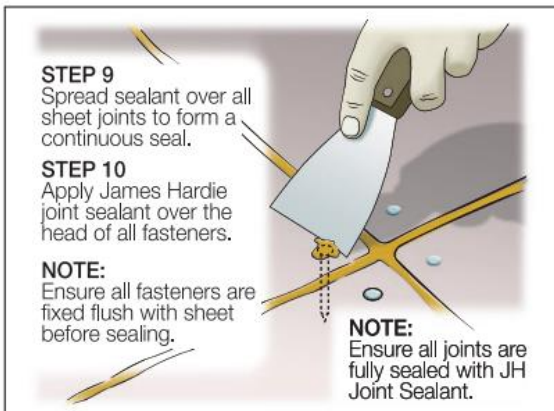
SEAL OVER FASTENERS AND JOINTS
